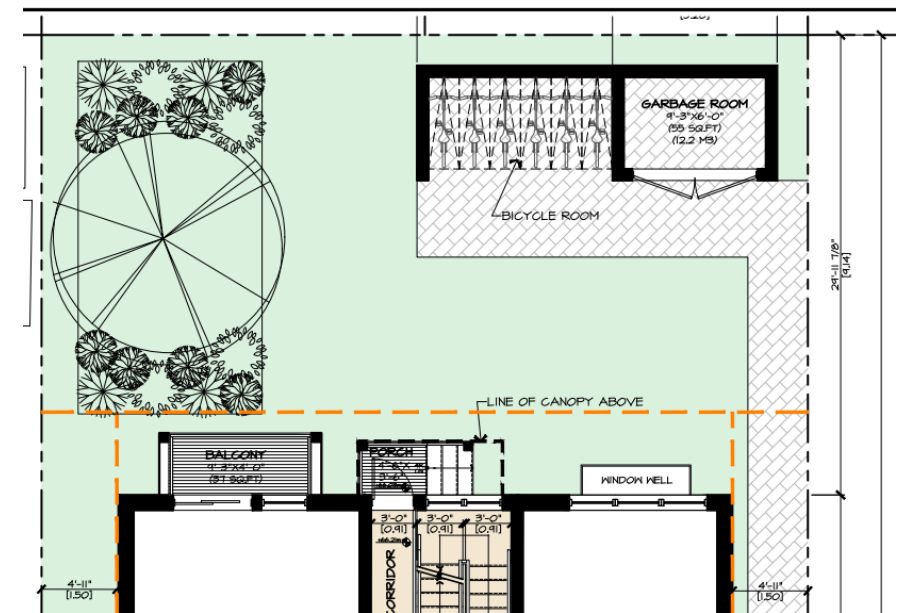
Large Planting Area at Southeast Corner of Subject Property
